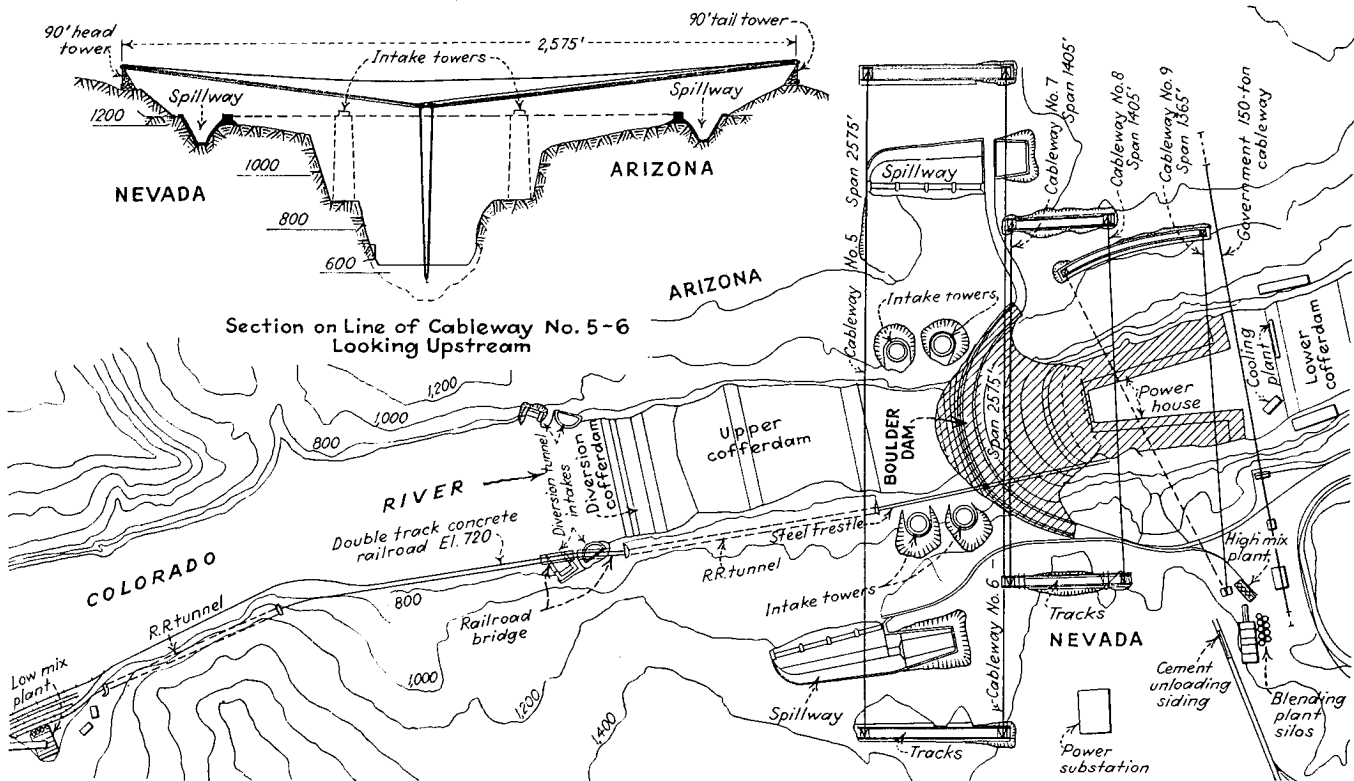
Layout of cableway system used for handling all forms and concrete for the dam, spillways, intake towers and power house. With the exception of the 150-ton unit, the cableways are to be used for the construction period only.
